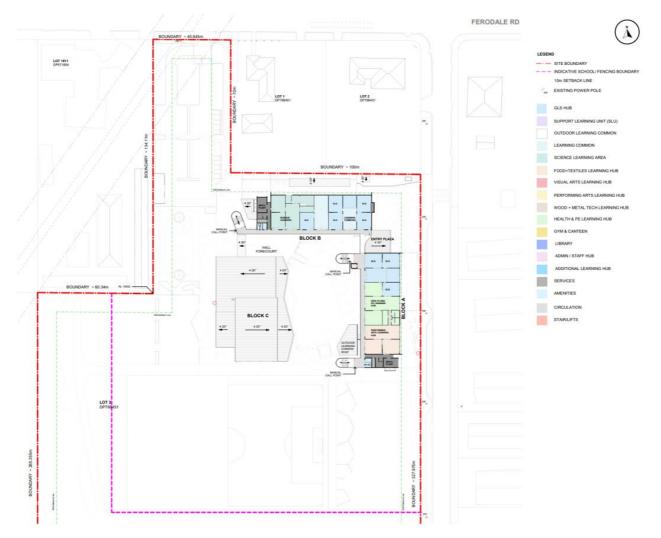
Proposed Level 2 Plan (Source: NBRS)
